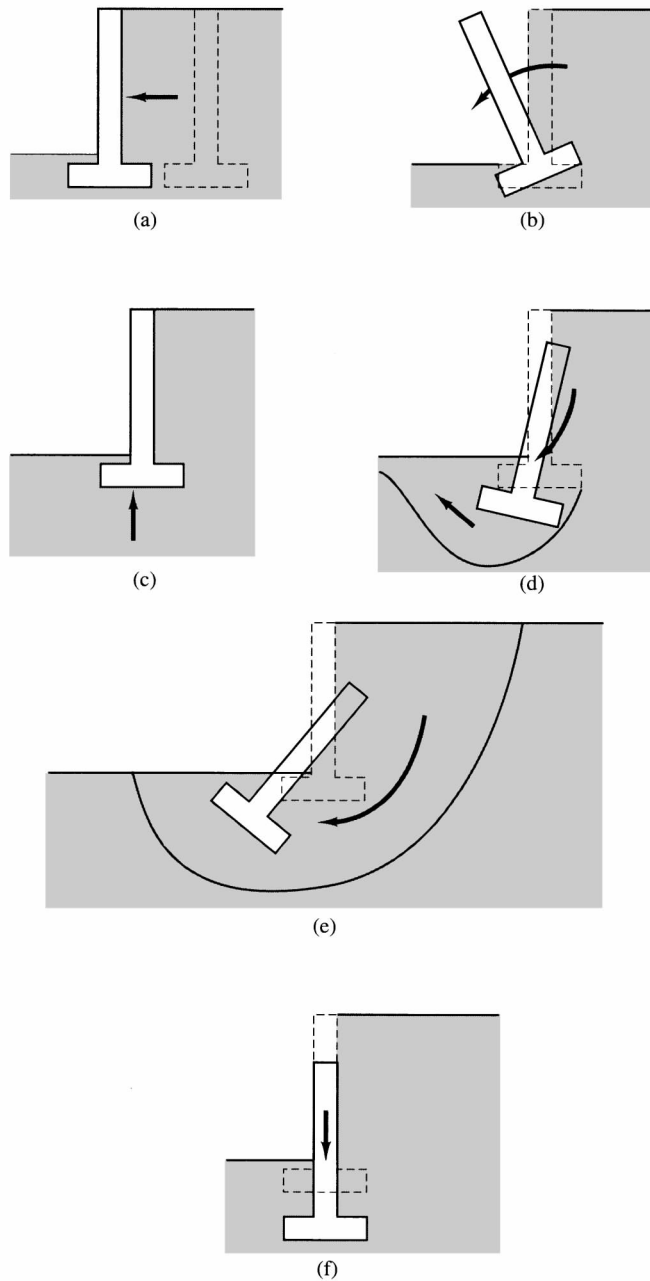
Potential external stability problems in a cantilever retaining wall: (a) sliding failure, (b) overturning failure, (c) normal force acting on the base of the footing not within the middle third, (d) bearing capacity failure, (e) deep-seated shear failure, and (f) excessive settlement.
